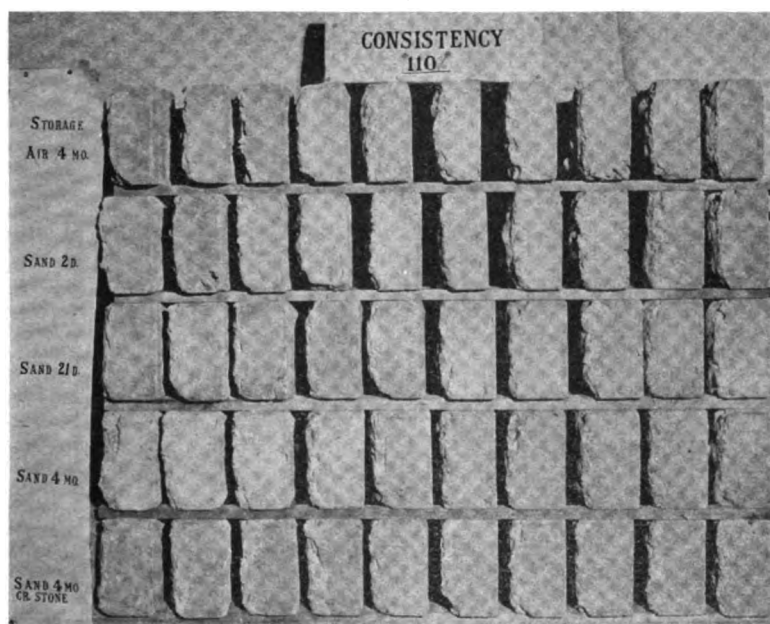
SIDE VIEW OF WEAR BLOCKS AFTER TEST.
